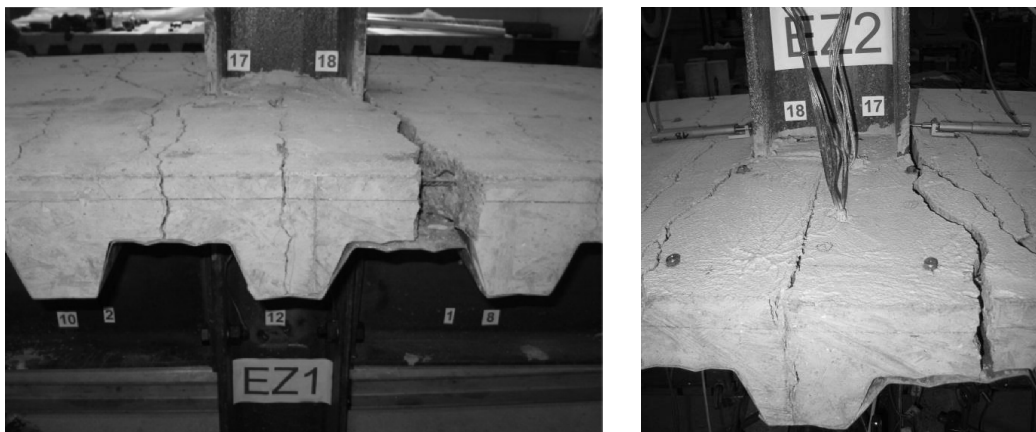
View of the cracked slabs of specimens EZ1 and EZ2
